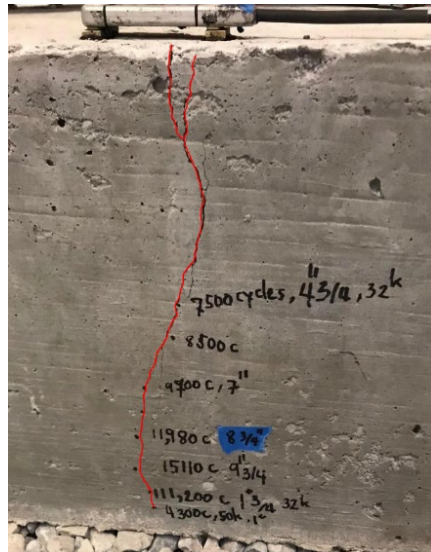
Cracking in concrete of Panel 1 at side
